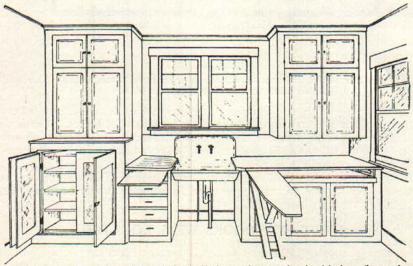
A perspective view of the built-in equipment in the kitchen floor plan shown in Figs. 2, 4, 5, 6
